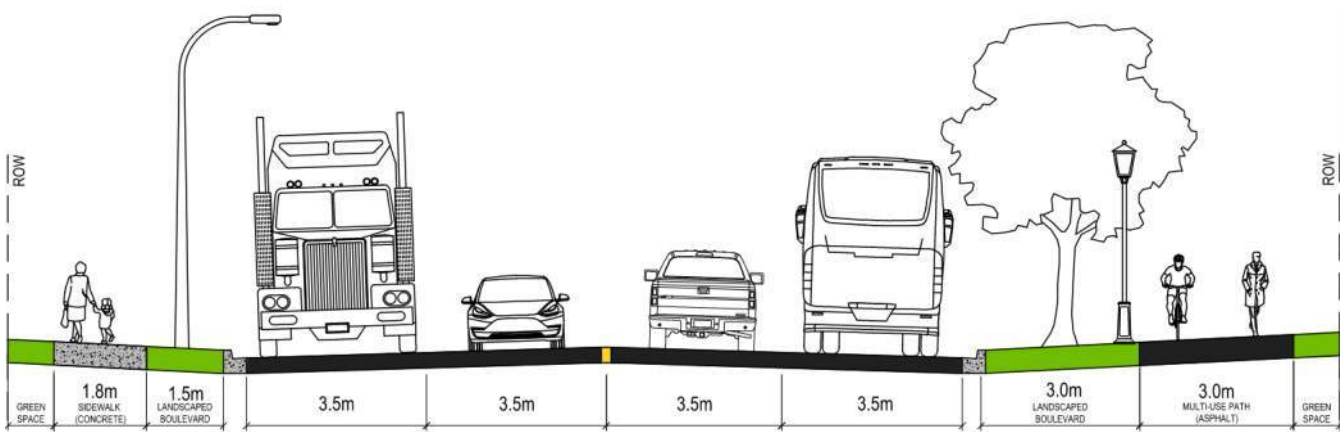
Typical Cross Section– from Belvedere Avenue to Young Street
